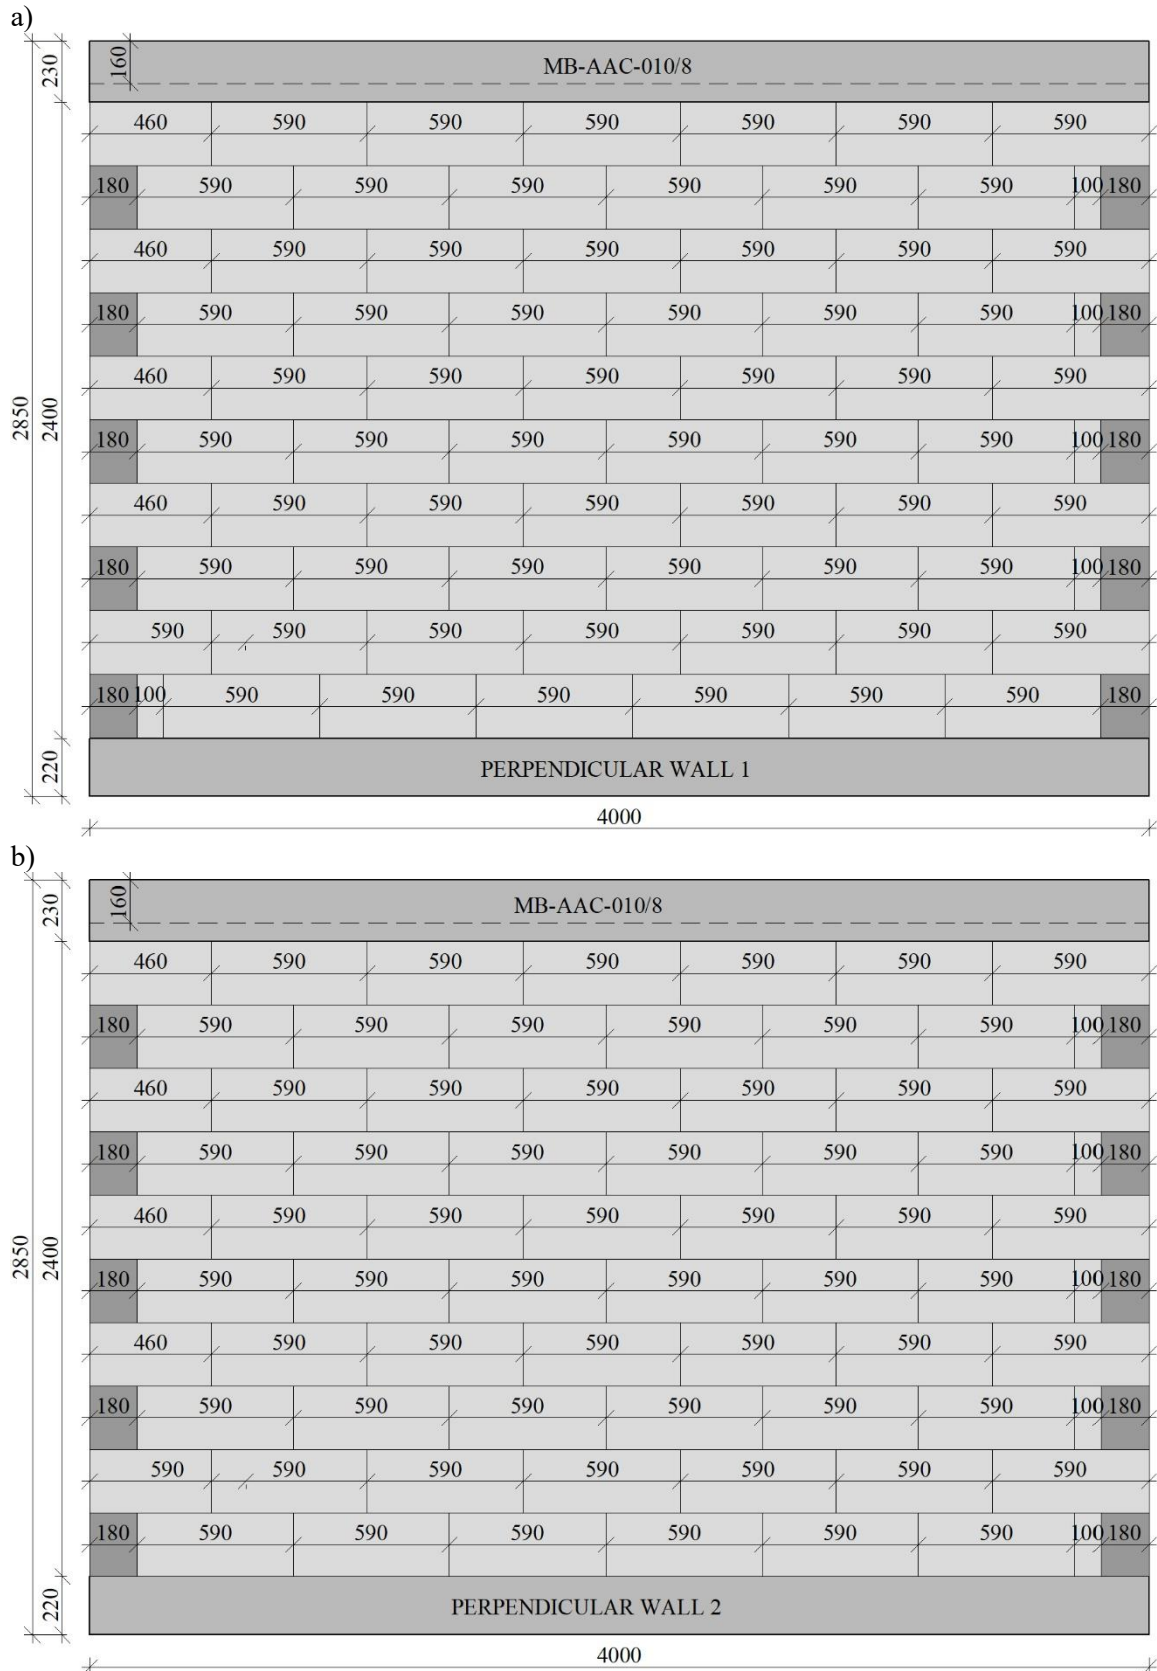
Design of the MB-AAC-010/8 model: a) perpendicular wall 1, b) perpendicular wall 2
